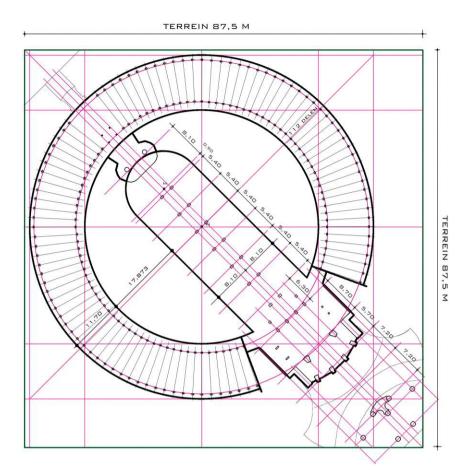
The Rijksverzekeringsbank in Amsterdam reduction drawing of the floor plan.
